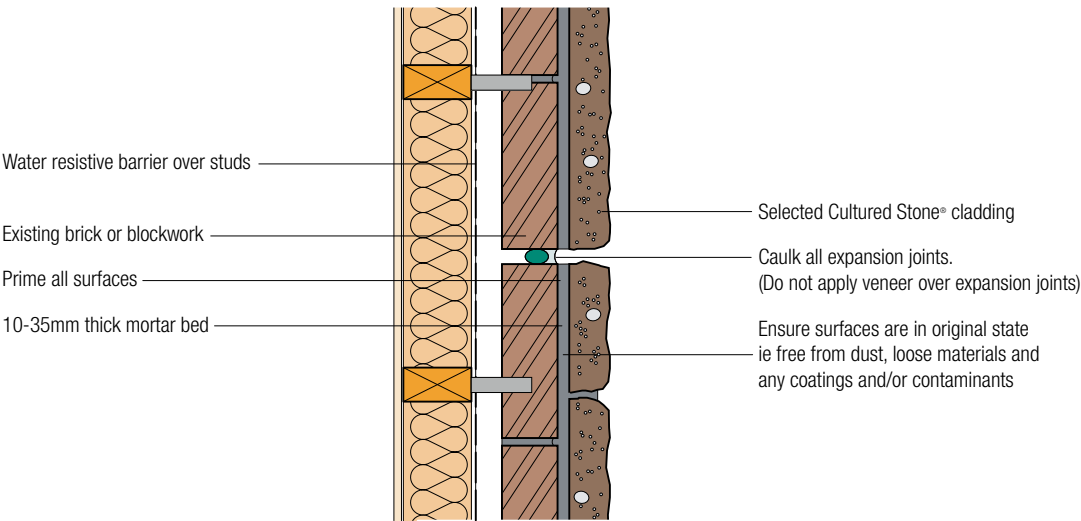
Brick or Block Work Veneer - Plan (Dwg # CS-03.02)
